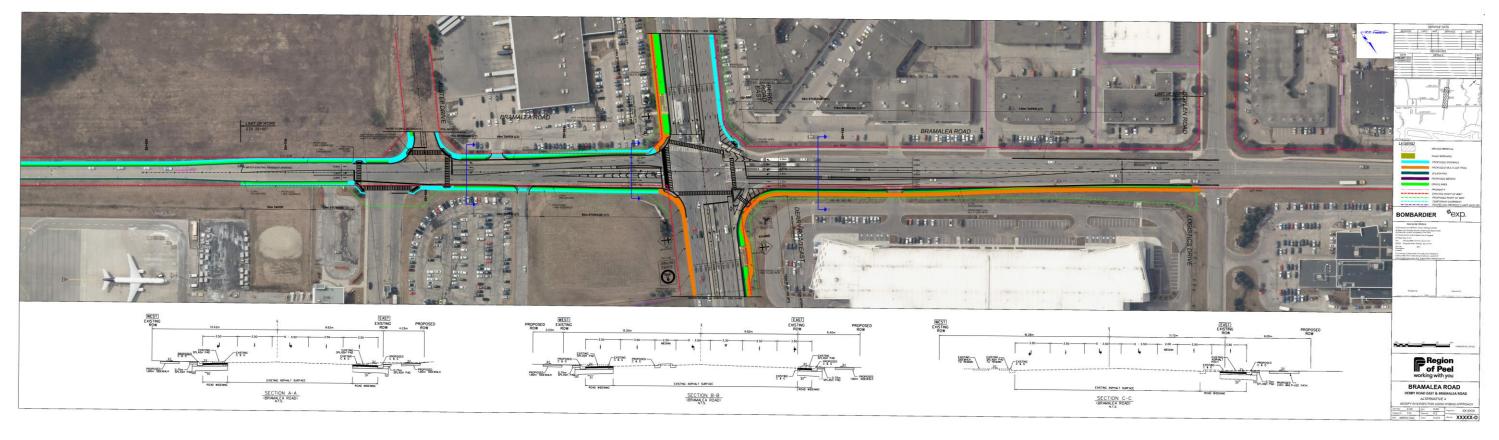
Derry Road East & Bramalea Road Preferred Alternative Design Concept (Bramalea)
